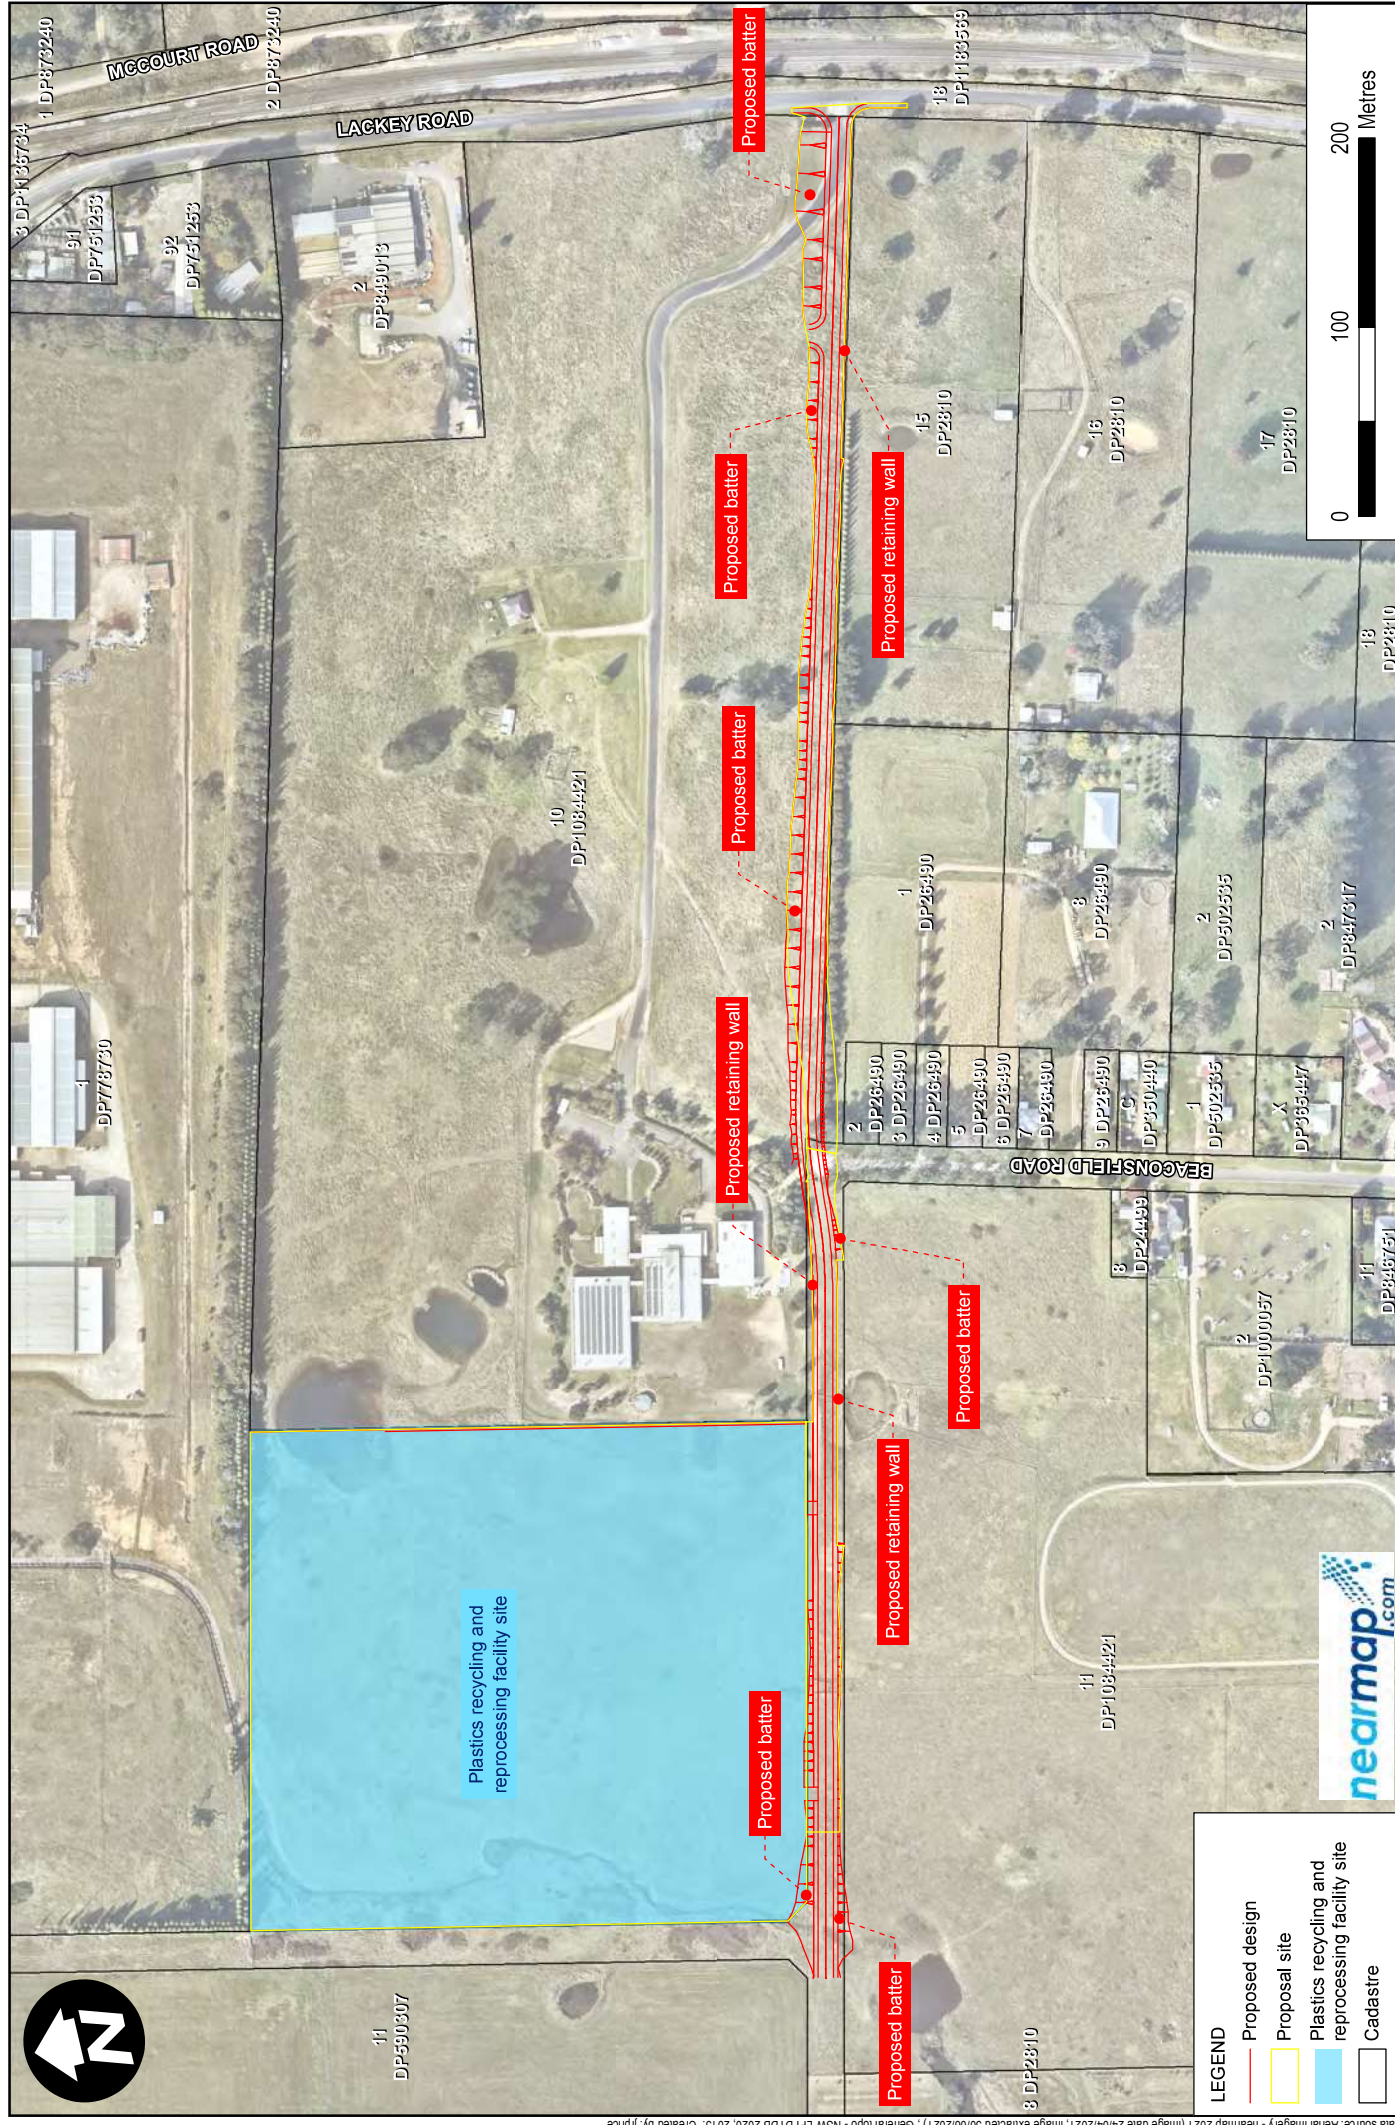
Option 2a: New access road – connecting Lackey Road with the plastics recycling and reprocessing facility site
